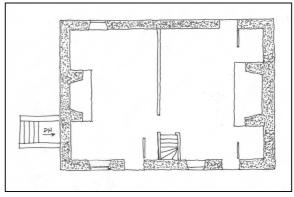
Lambert Jenkins House, Jenkinstown Rd. (Town of Gardiner), 1794, floor plan. Sketch plan drawn by Neil Larson, 2001.
